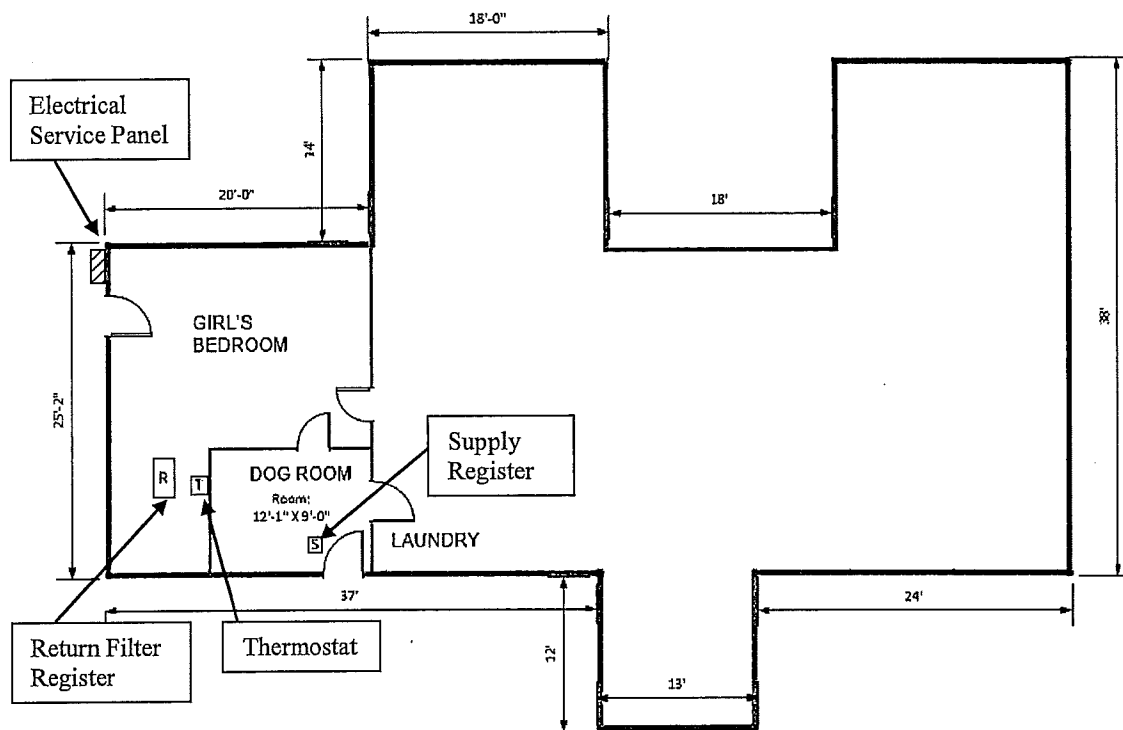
Plan view of house with dimensions for exterior and interior areas of interest. Not to scale.
